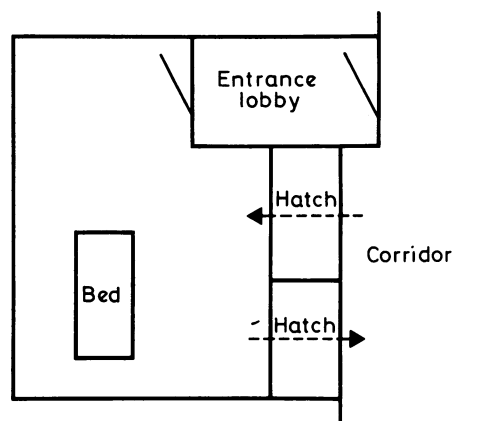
Addition of unventilated entrance lobby and pass-through hatches to room layout; broken arrows indicate movement of materials. Room ventilation may be as indicated in fig 1 (a) or (b).
